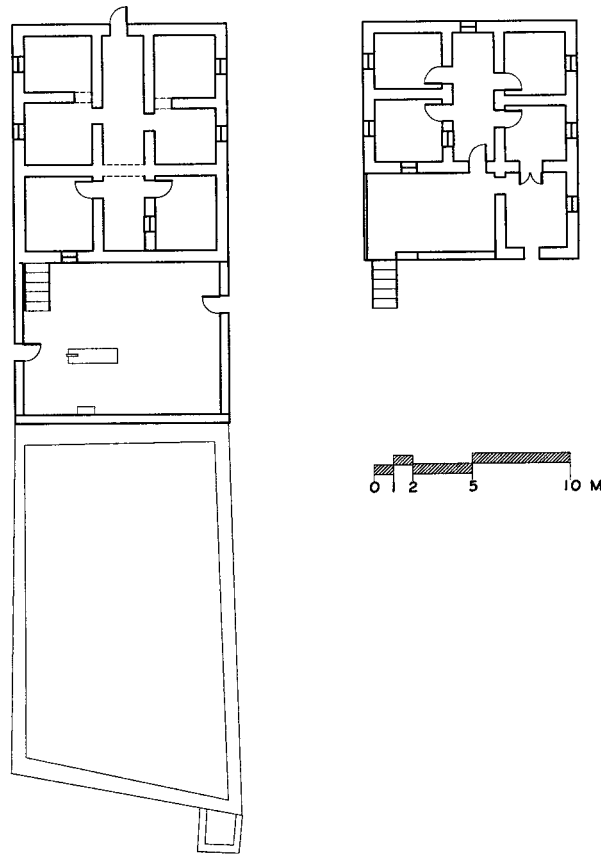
Plans of D. Dursun house complex with storage and bathing at street and courtyard level.
